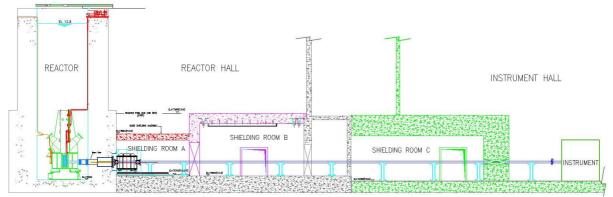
The overview of the neutron guide system including reactor, in-pile plug assembly, primary shutter, neutron guides, guide shielding room and instruments
